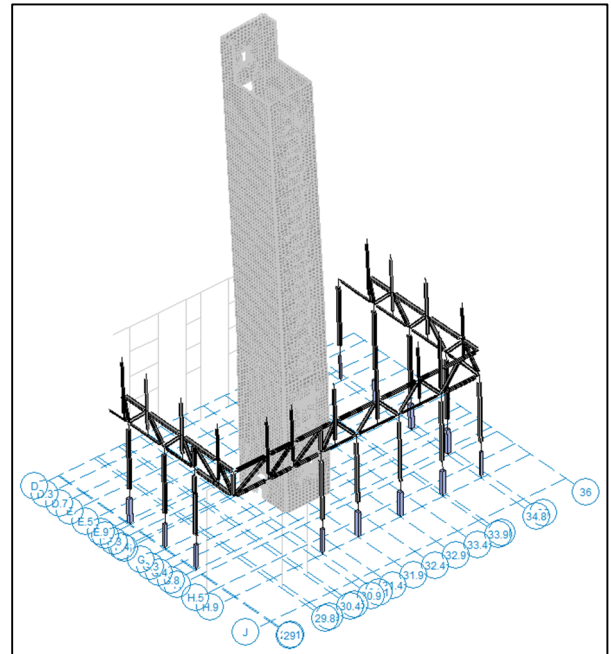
RISA-3D Model of the Concrete Core and Belt Truss Cantilever
